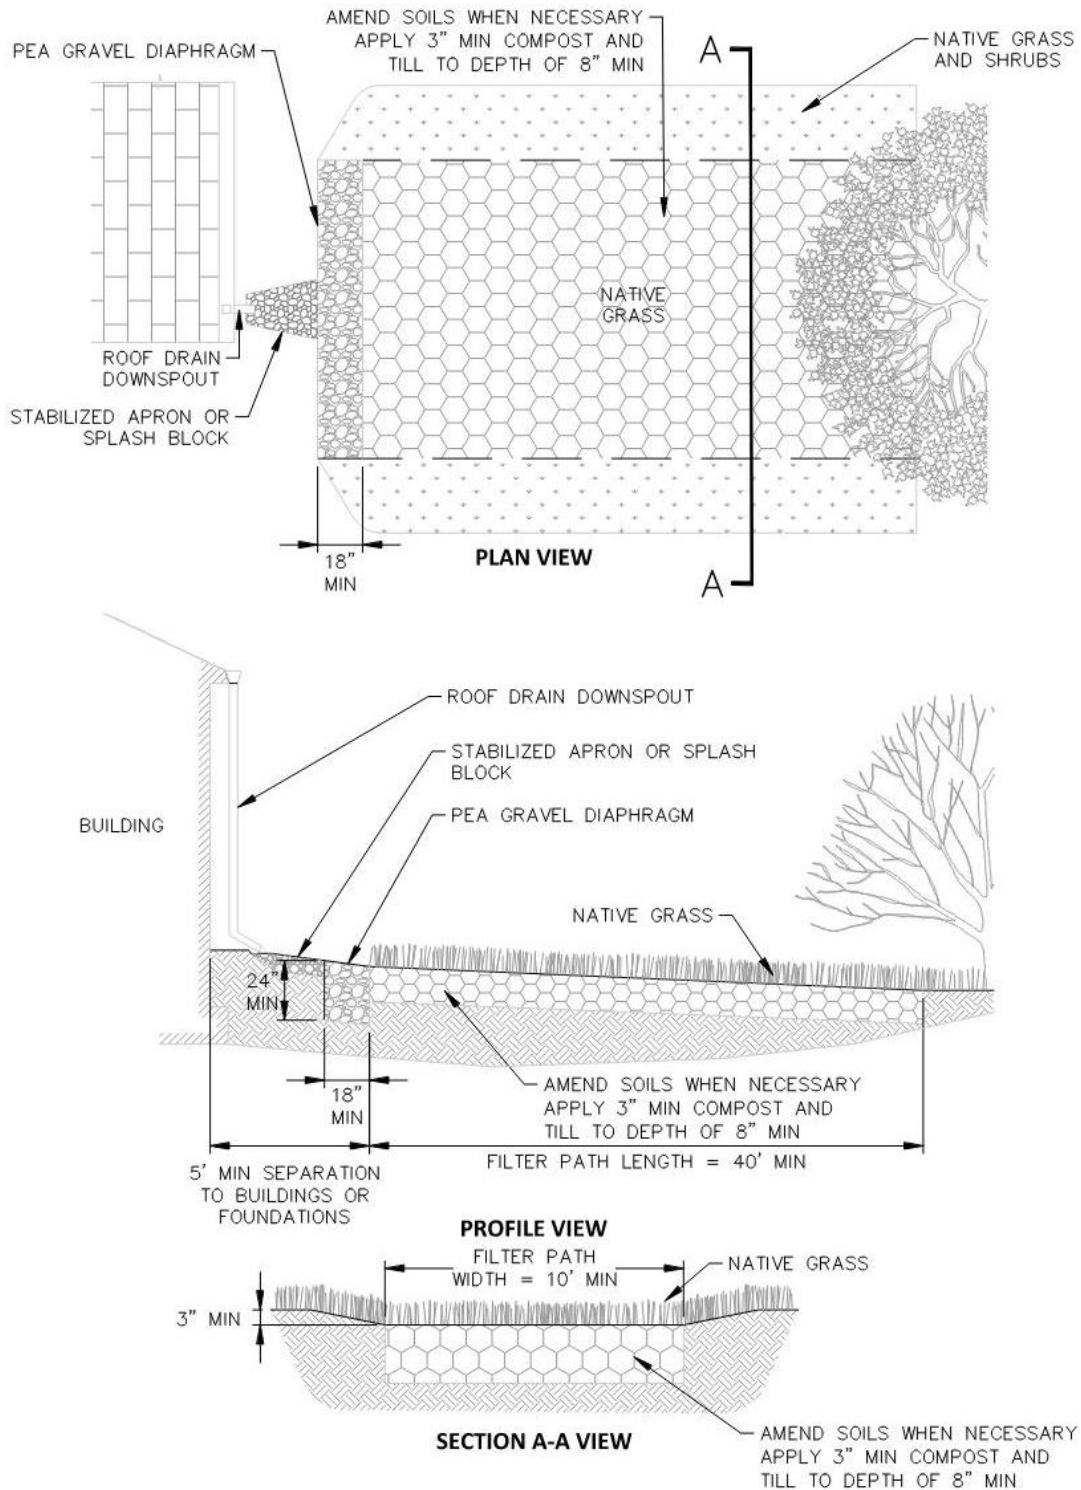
Disconnection of Rooftop Runoff (RR-4)
